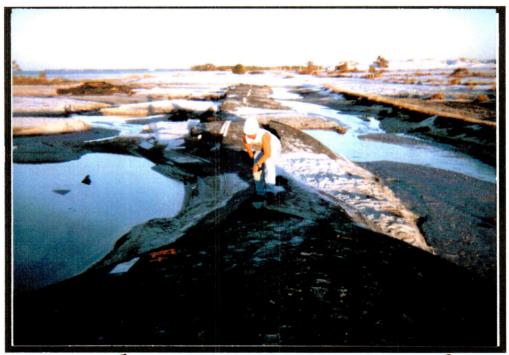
LOCATION SANTA ROSA ISLAND, FL ON GULF OF MEXICO @ OKALOOSA STATE PARK AND U.S.98
